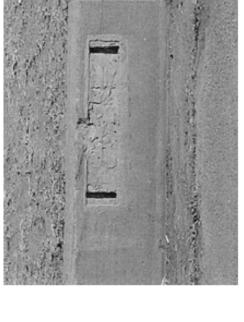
CEMENT WORKERS CONCRETE CO. McKinley to Roosevelt, mid-block.
